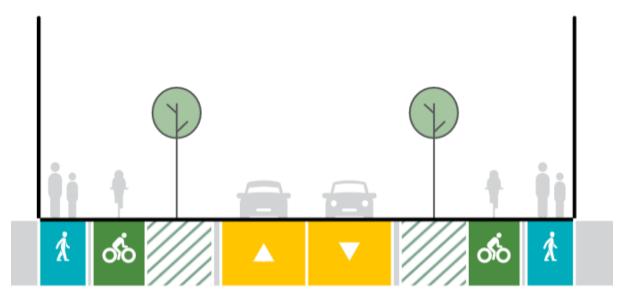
Indicative 20m Road Corridor Cross Section – Meryl Avenue
